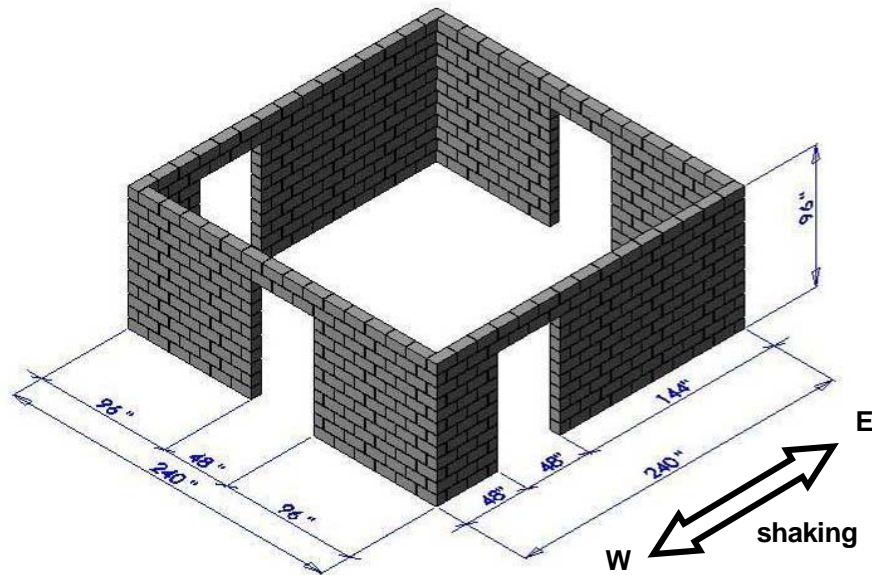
Overall view of CMU building specimen (CMU walls only)
